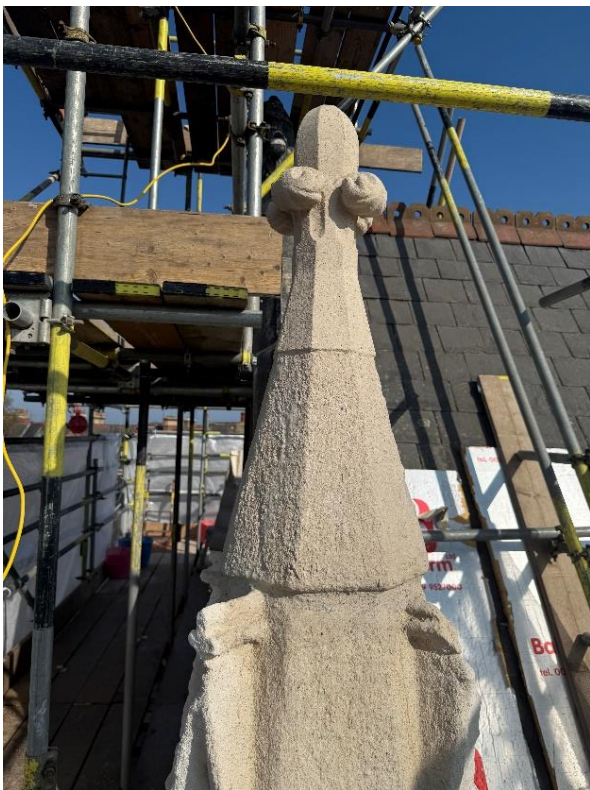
Rebuilt Pinnacle showing new carved finial (Top section), note filled joints & Sheltercoat
